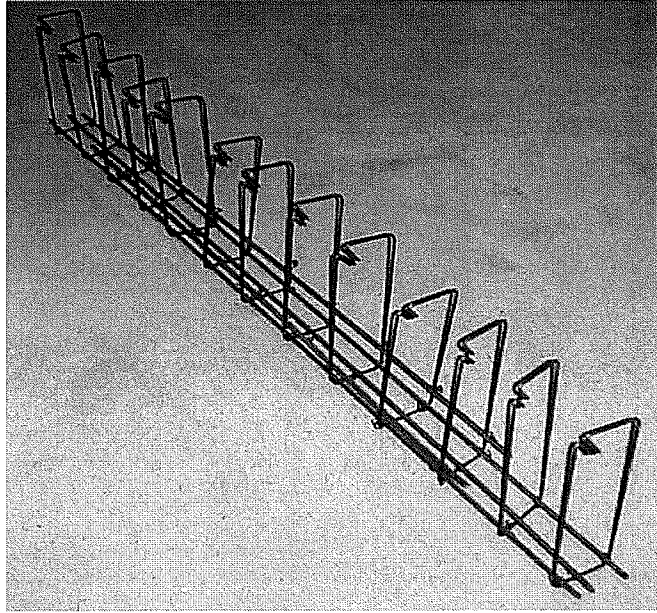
The Reinforcement Cage Used in Reinforced Concrete Beams.
